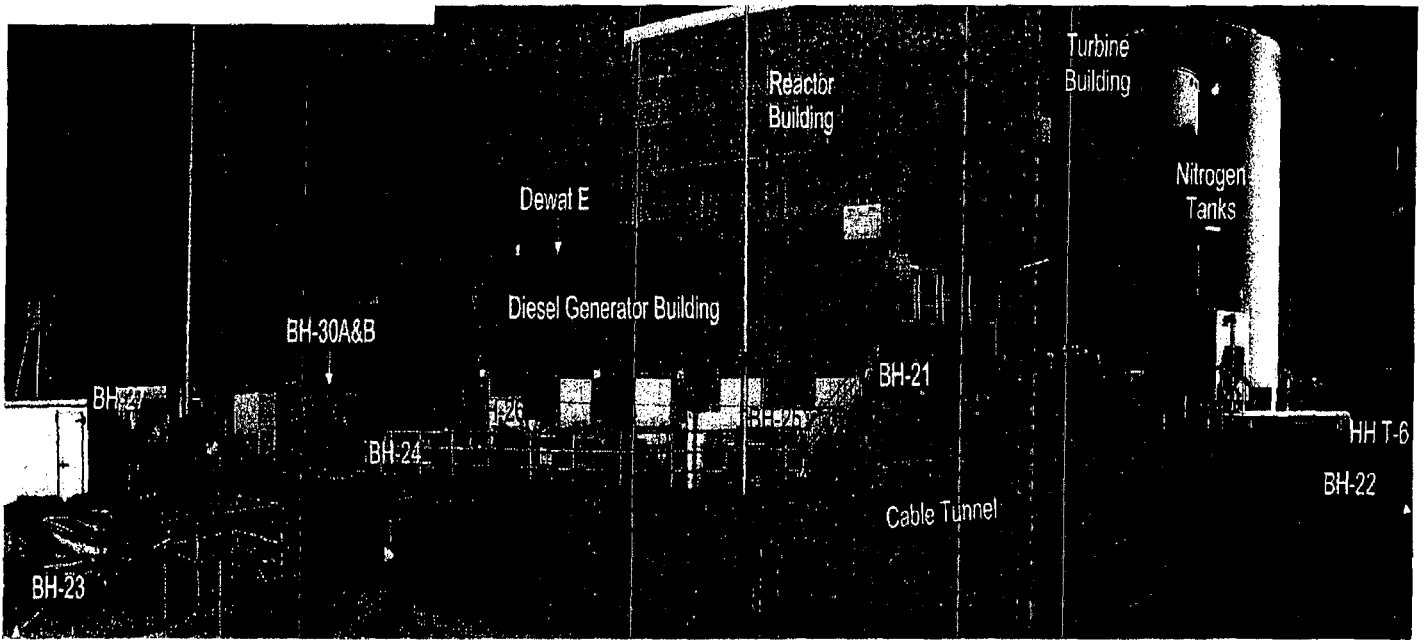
Panoramic Photo of Southeast Service Bay (facing west)
